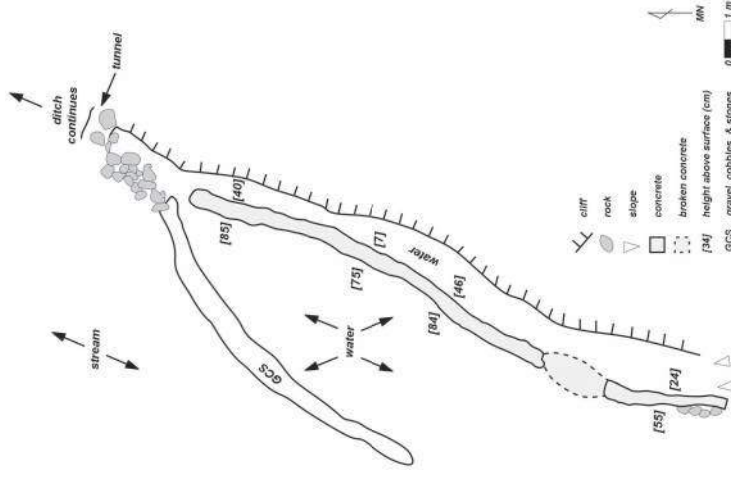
Feature 08920a ditch, plan view drawing (note that only the portions of the wall visible above the water are shown).
